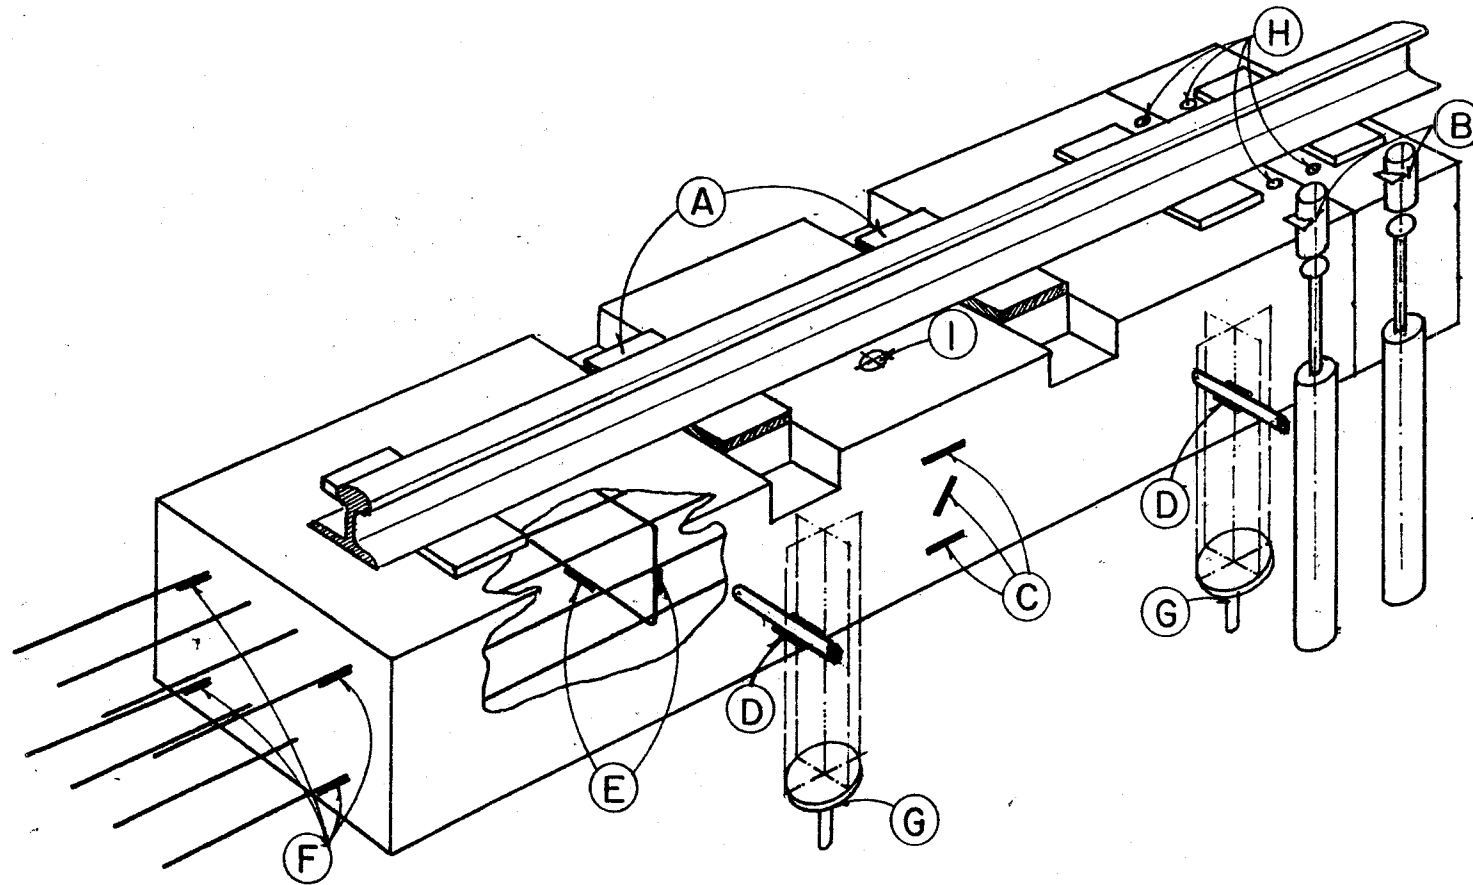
INSTRUMENTATION LAYOUT FOR SECTIONS 4 AND 7
